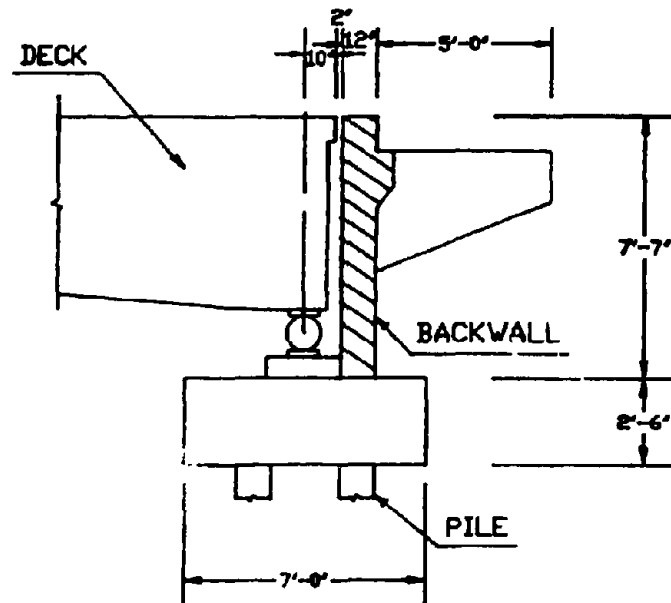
Abutment Cross Section in San Gregorio Bridge.
